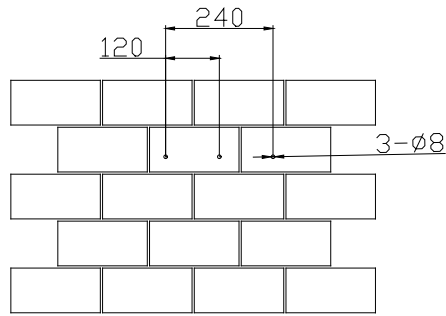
Drill hole dimensions of R5-3K/3.6K/4K/5K/6K-S2
